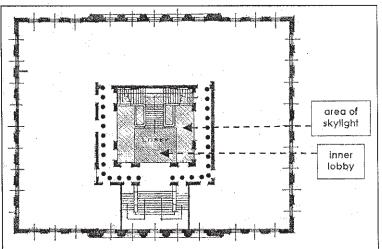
Spatial arrangement of first floor. Dotted line indicates extent of wall painting. Two additional panels, visible from lobby, are placed on wall of stairwell to basement.
